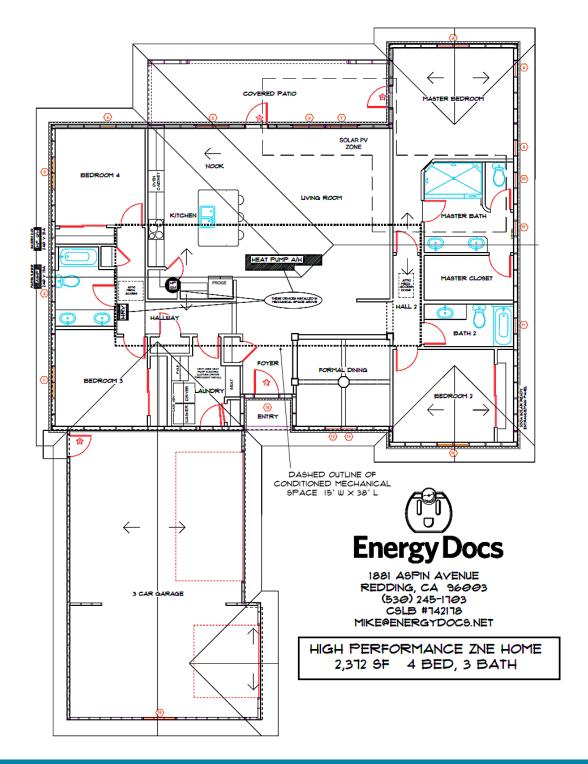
REDDING HOUSE FLOOR PLAN.
